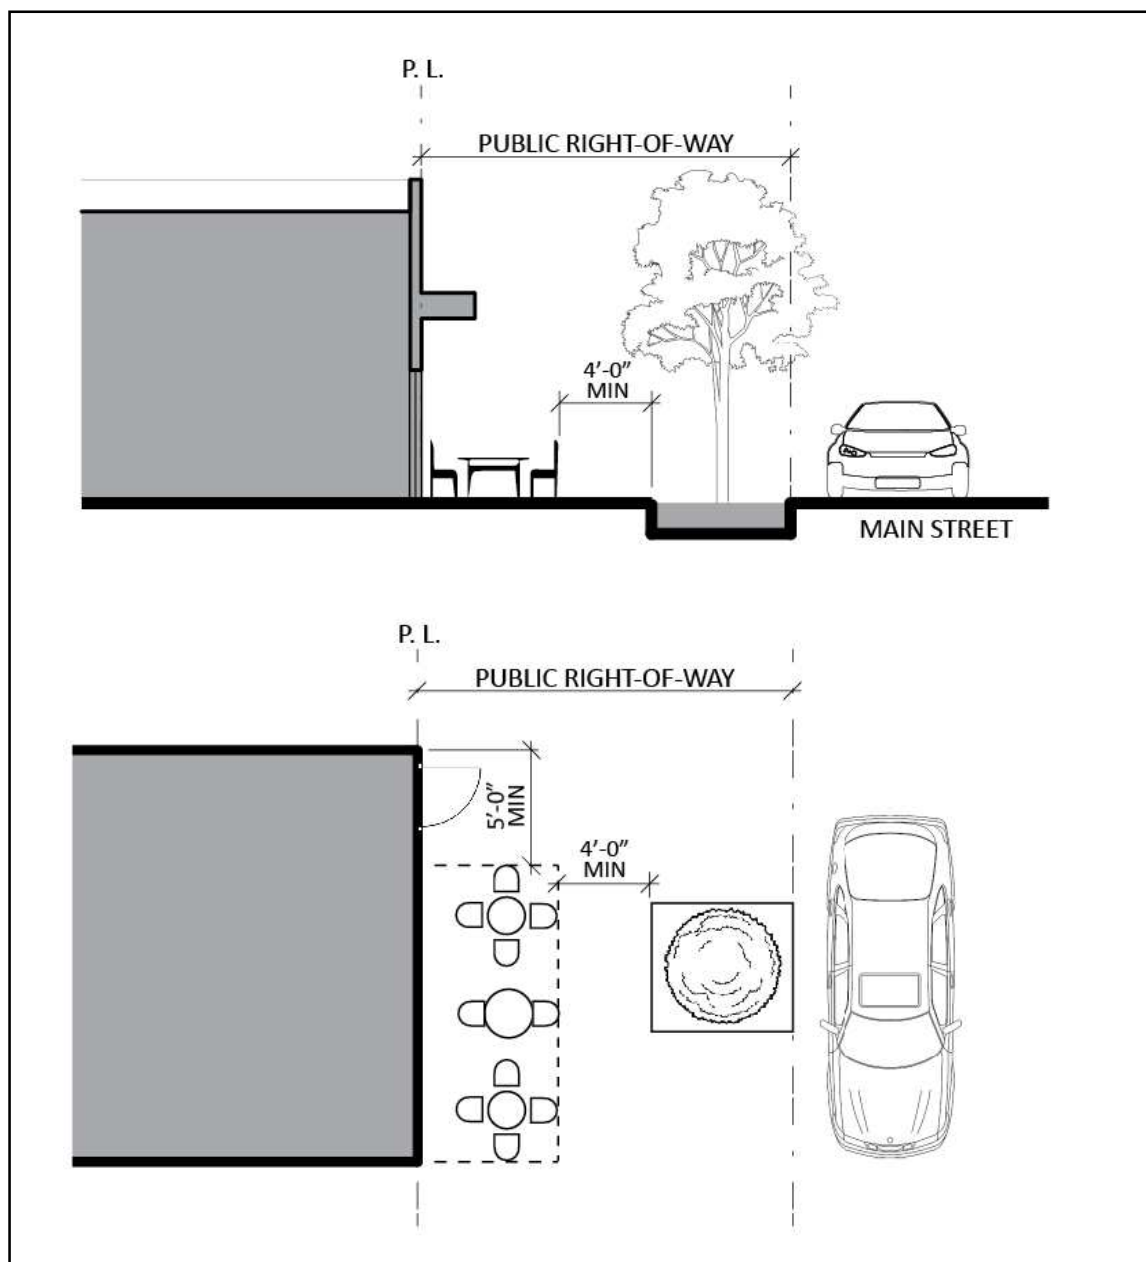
Example of an outdoor dining area in the public right-of-way abutting a storefront wall without a barrier.
